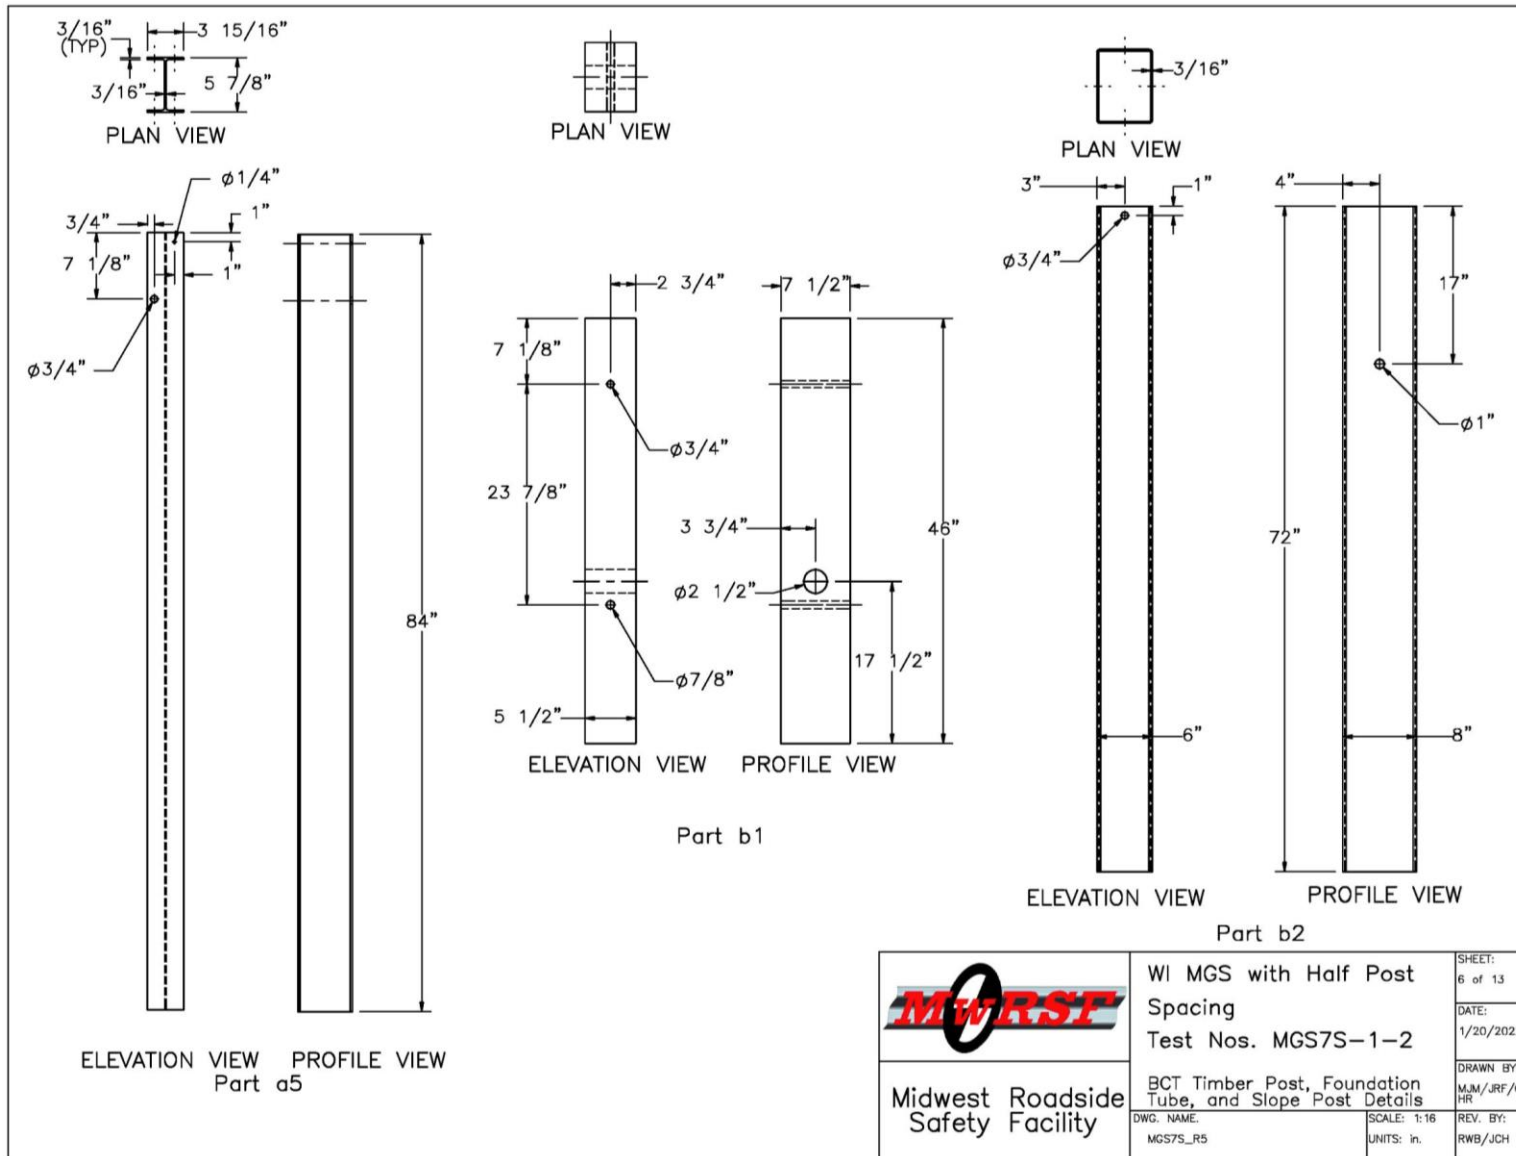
BCT Timber Post, Foundation Tube and Slope Post Details, Test Nos. MGS7S-1 and MGS7S-2
